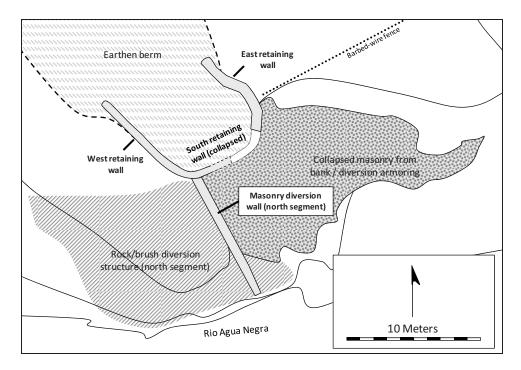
Northern portion of diversion complex showing retaining walls, masonry bank armoring, diversion remnants and portion of berm.
